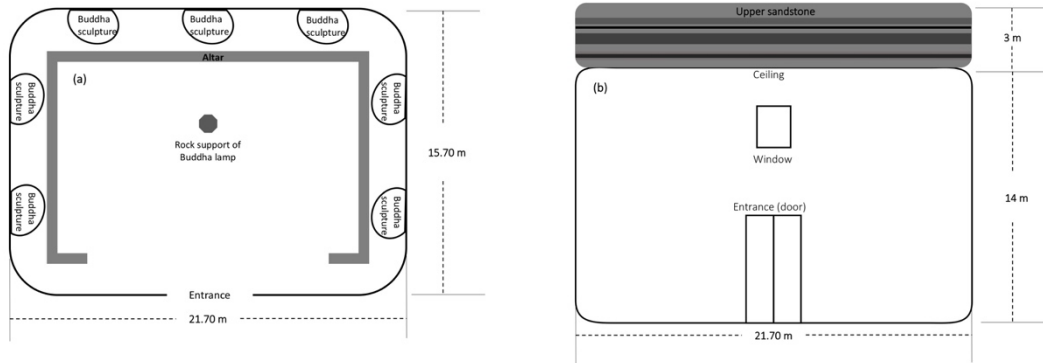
(a) the floor plan of 165 Cave, and (b) the Main view of 165 Cave
